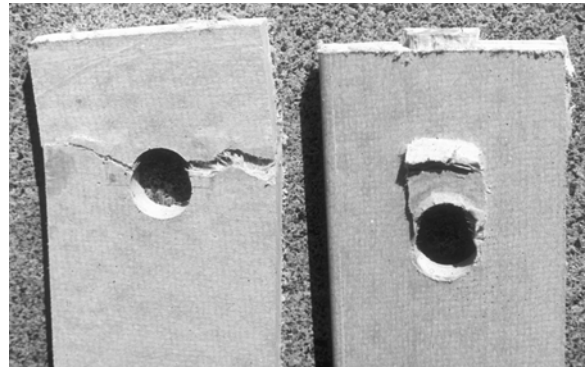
Failure of pultruded GFRP test specimen with bolted connection. (CCLab)
